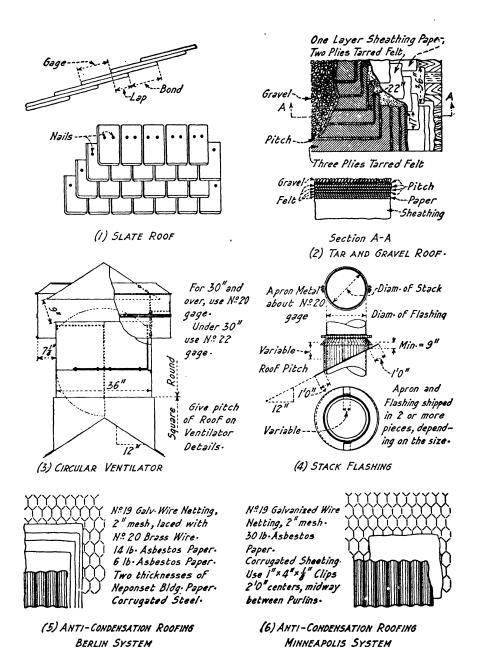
Details of Roofing, Ventilators and Anti-Condensation Lining.
